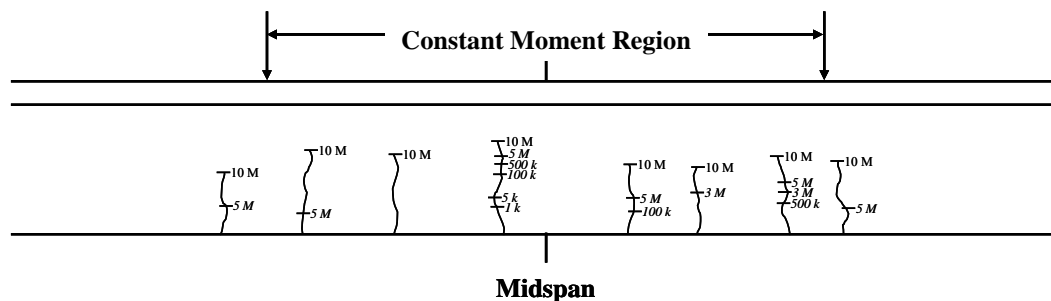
Crack Pattern for Beam 6A after Baseline Static Test
